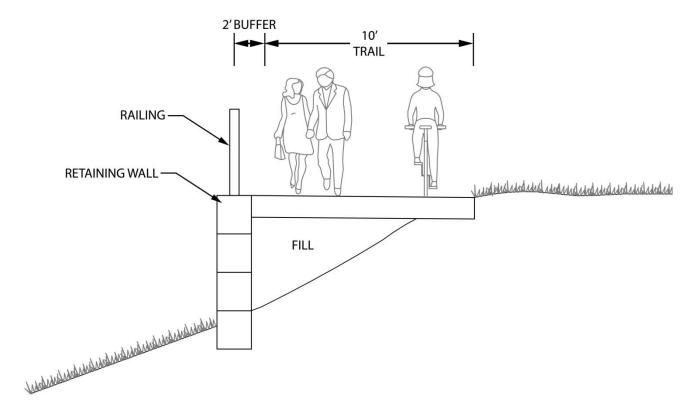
Typical raised Old Cameron Run Cross Section with Retaining Wall
